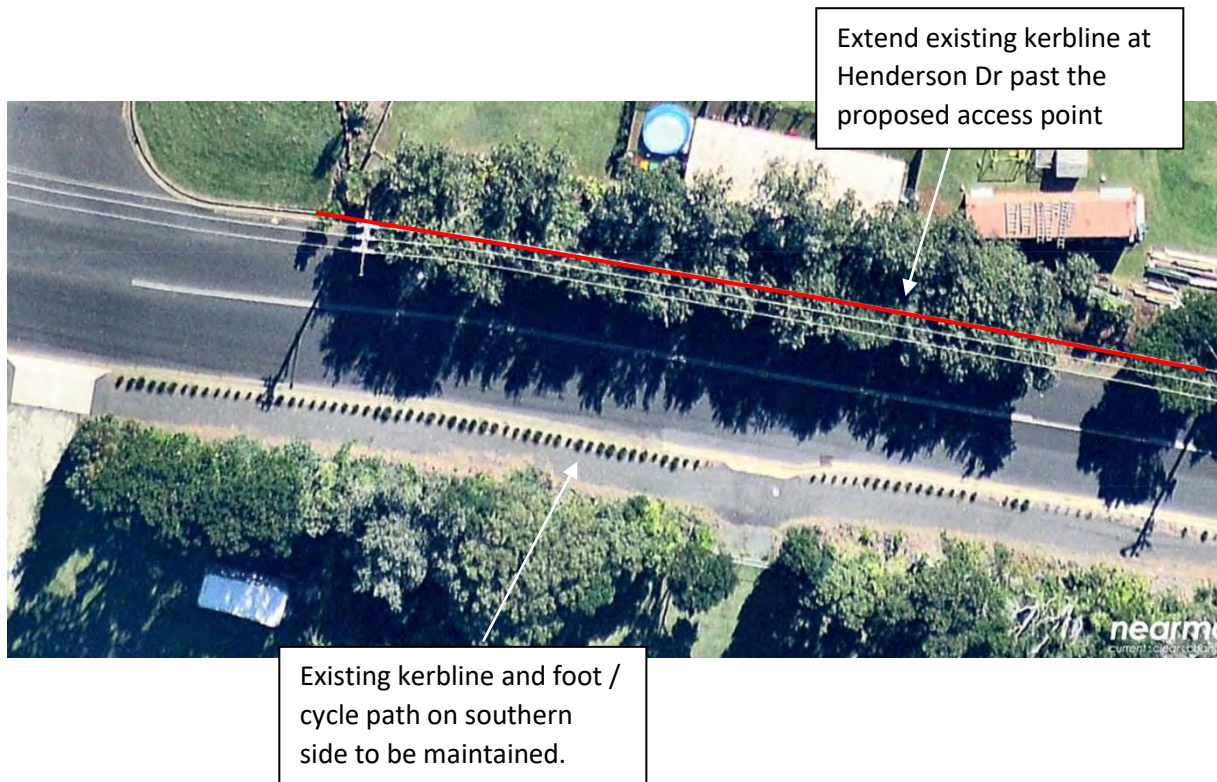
RECOMMENDED EXTERNAL ROAD UPGRADE WORKS
